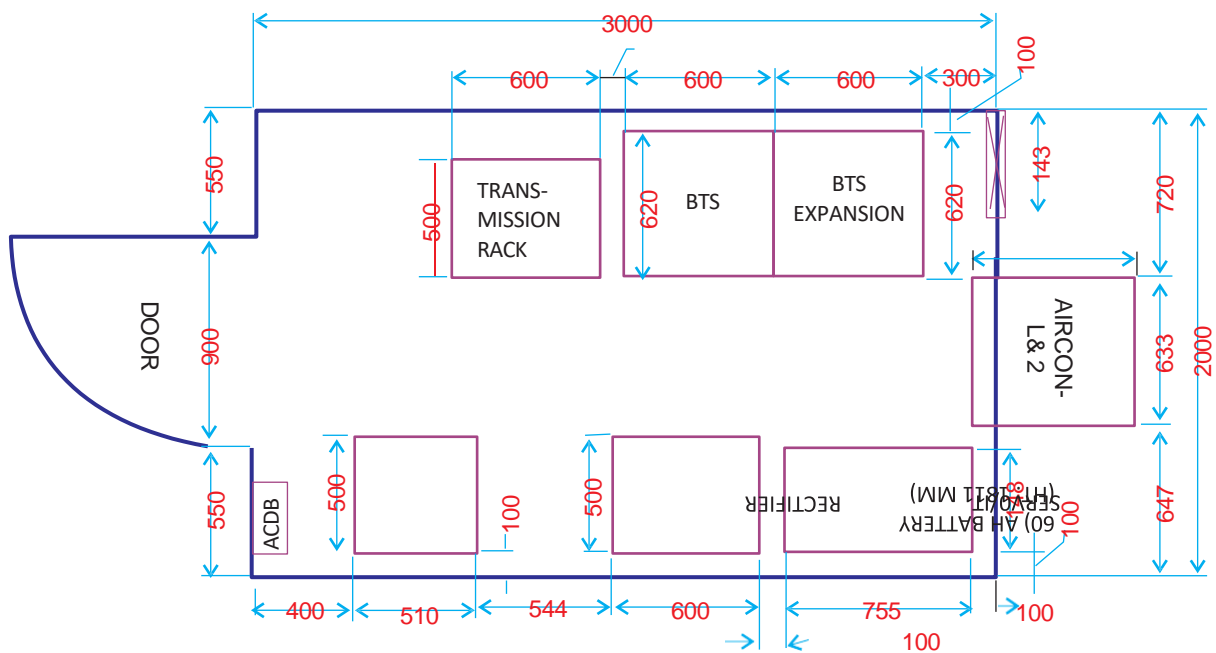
(ii) 1.3*2*2.5m Shelter-Design Recommendation
